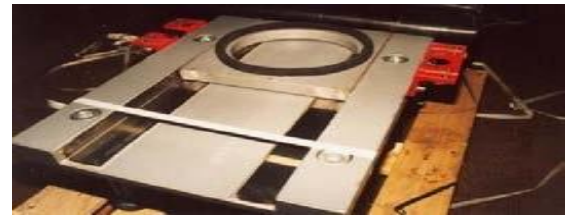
Fig. G. Guide bearing with lower sliding plate and portable element applied in Płock bridge.
